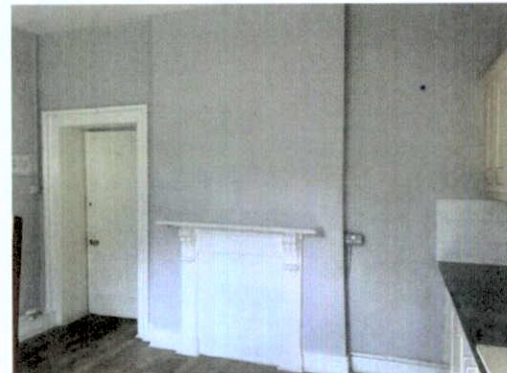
Kitchenette on lower ground floor. Original chimneypiece, paneled door, moulded architraves and skirting. Later fixtures and fittings.
